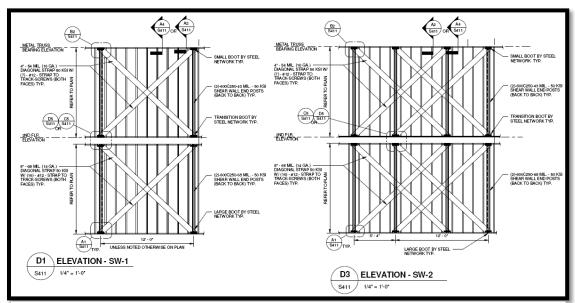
Shear Wall Straps - Courtesy of Barton Malow
